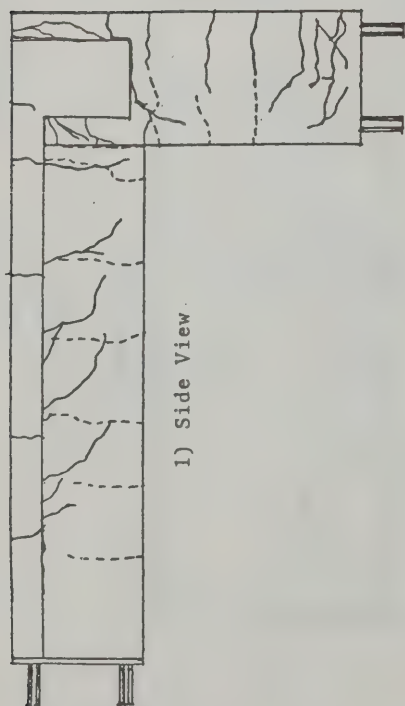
Crack Pattern (Specimen T-1)
